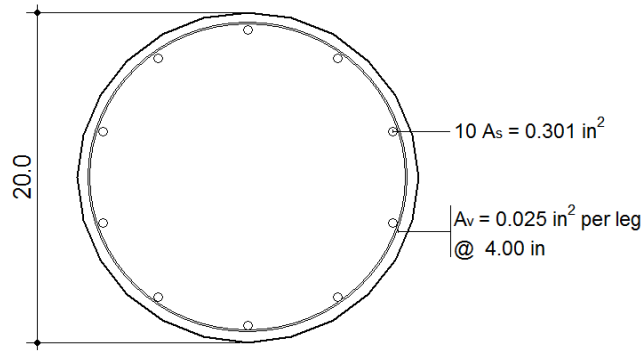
Ranf et al. (2006)-SpecimenC2 cross section
